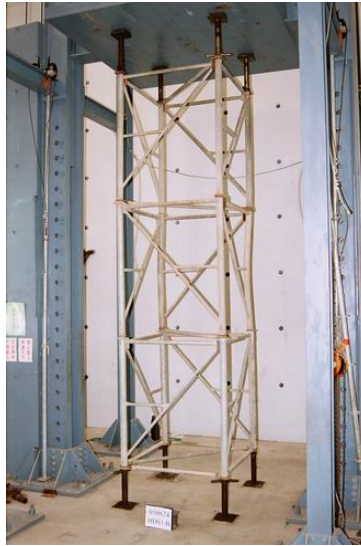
Failure Model for Three-story Independent Heavy-duty Scaffolds with Extended Top and Base Screw Jacks under Loading
